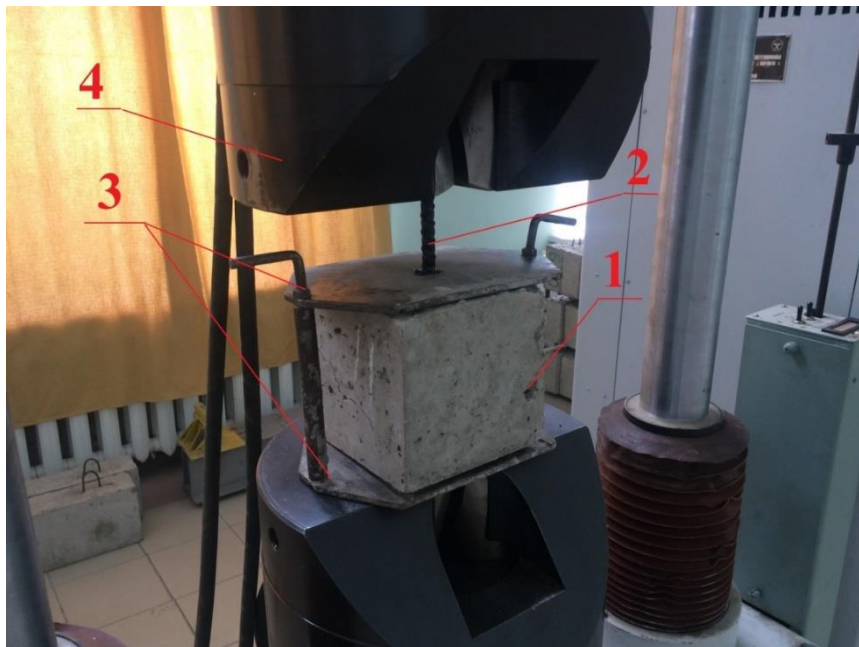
General view of laboratory test installation: 1 – concrete cube, 2 – basalt fiber polymer rebar, 3 – gripping device, 4 – tension machine.
